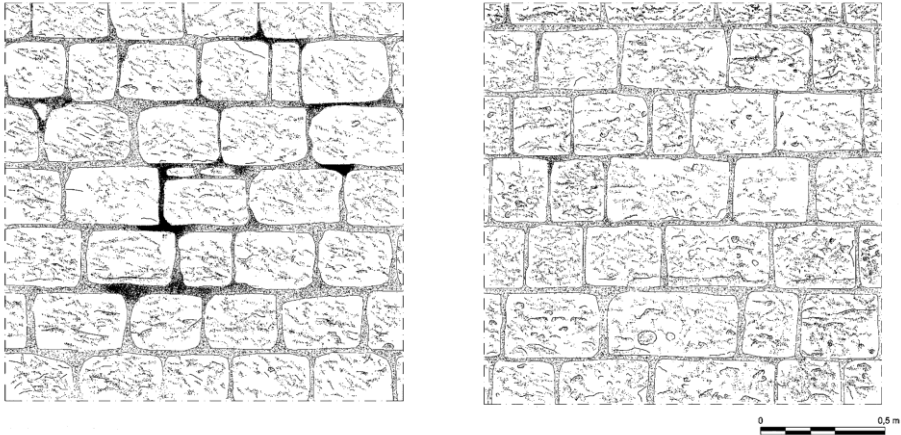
on the left, S. Maria Capua Vetere (CE), building in P. Fratta street, eastern façade, ground floor, grey tuff masonry with rows of blocks 22-24 cm high (first half of the XIX century); on the right, Carinola (CE), Spano farm , south façade, grey tuff masonry with rows of blocks 25-27 cm high (second half of the XIX century).
